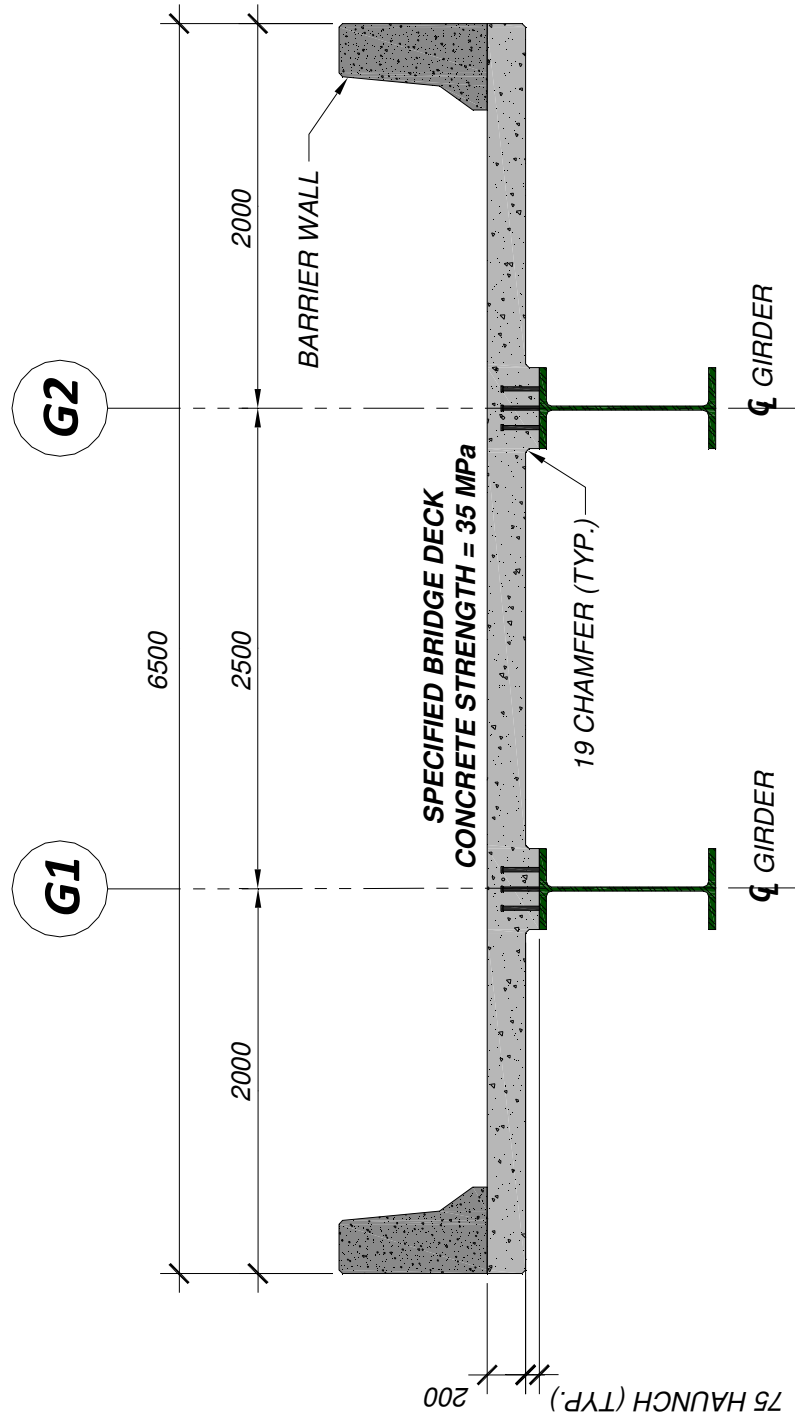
(b): Transverse cross section of the bridge deck slab concrete details (Cross section “A” from Figure 3-4(a))
